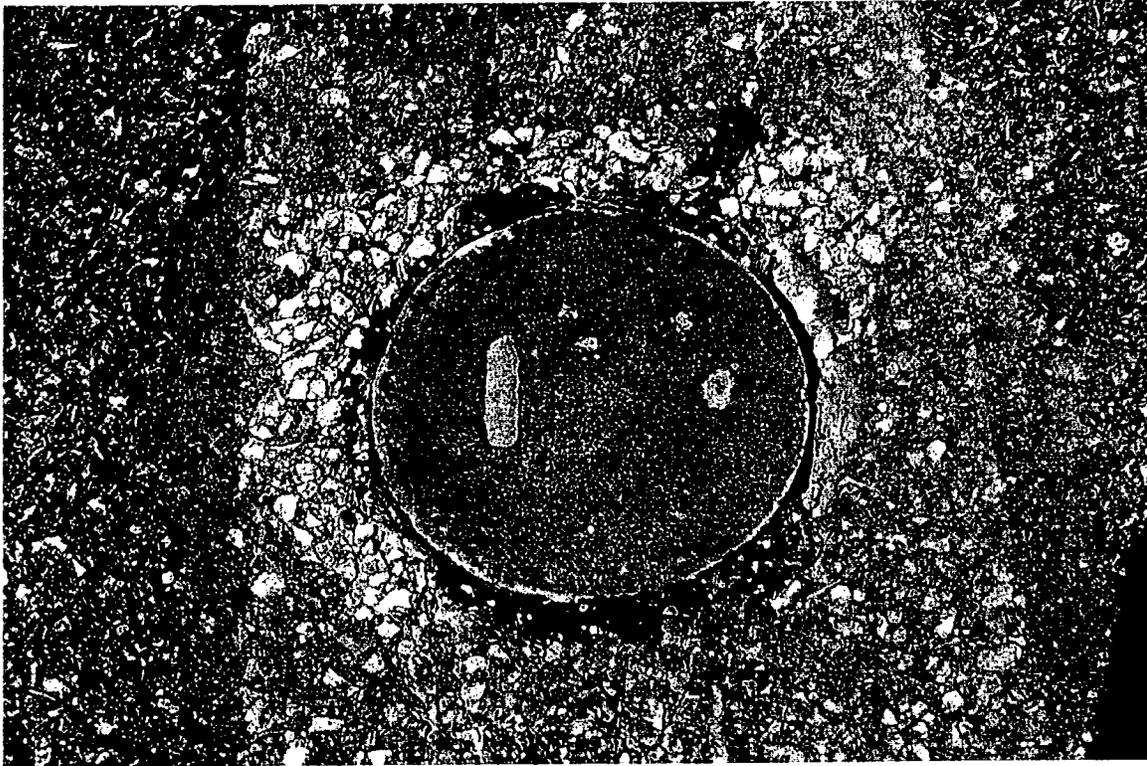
Pavement sensor (EB driving lane) at Continental Divide.
